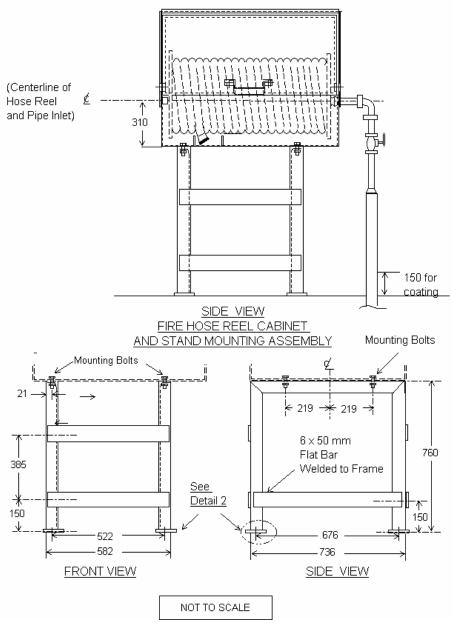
Fire Hose Reel Cabinet Typical Plan, Section and Details (Continued Next Page)
